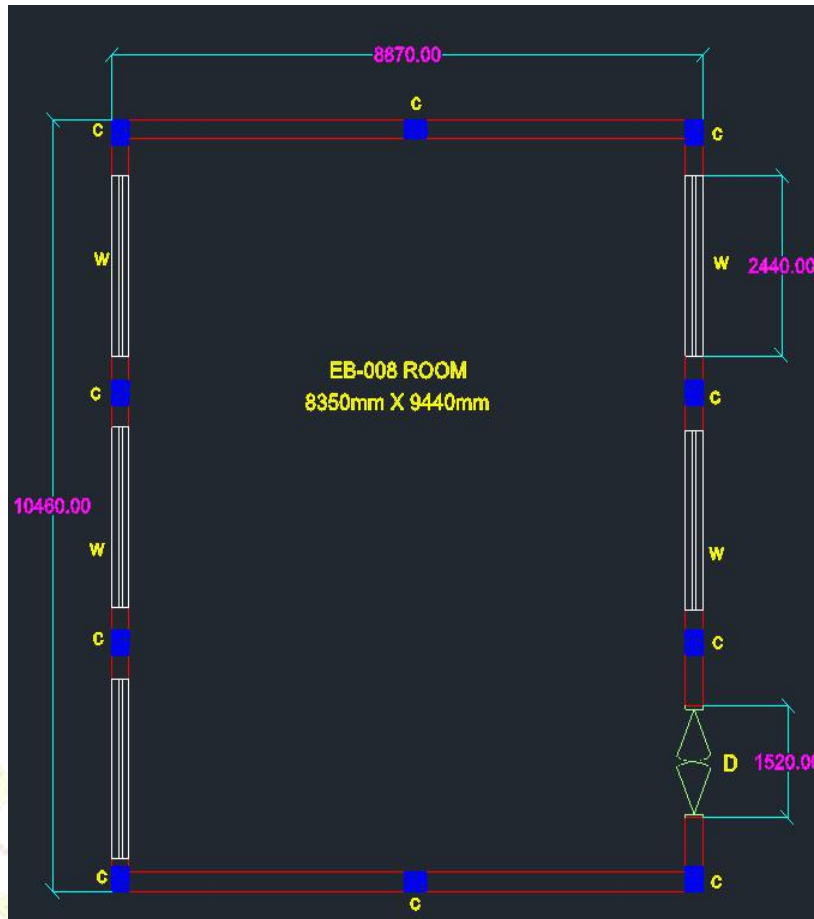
Two-Dimensional Plan of EB-008 Room (All dimensions are in mm)
